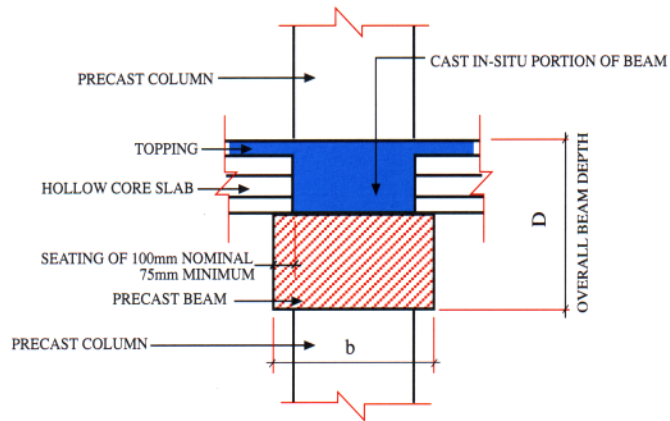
HOLLOW CORE SLAB ON PRECAST BEAM
